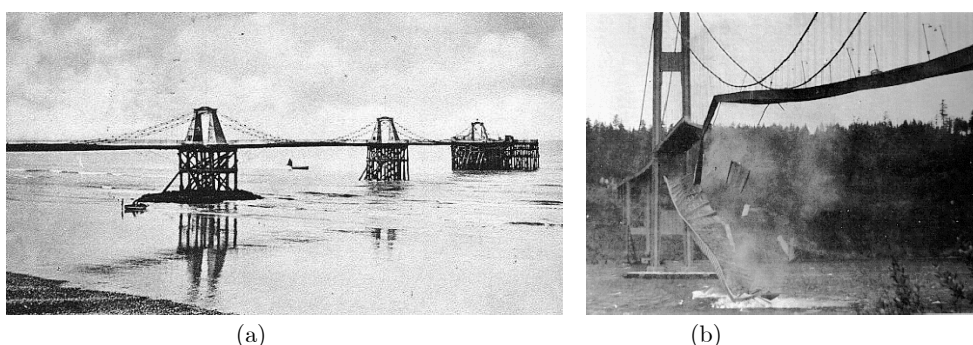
Brighton Chain Pier (a); collapse of the original Tacoma Narrows Bridge (b)
